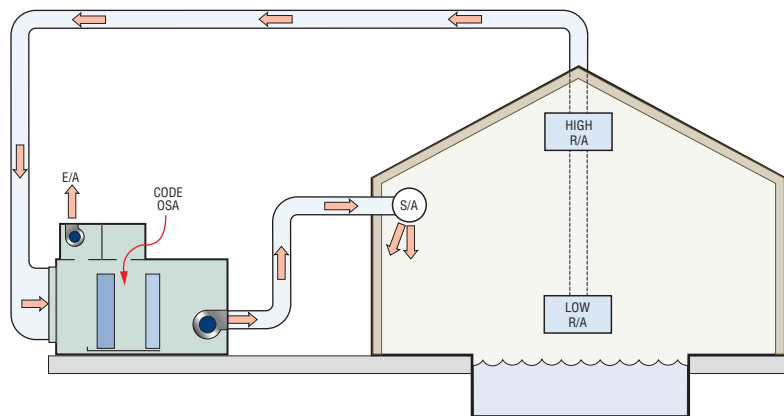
Extended Outdoor Air System Conceptual Airflow Diagram
